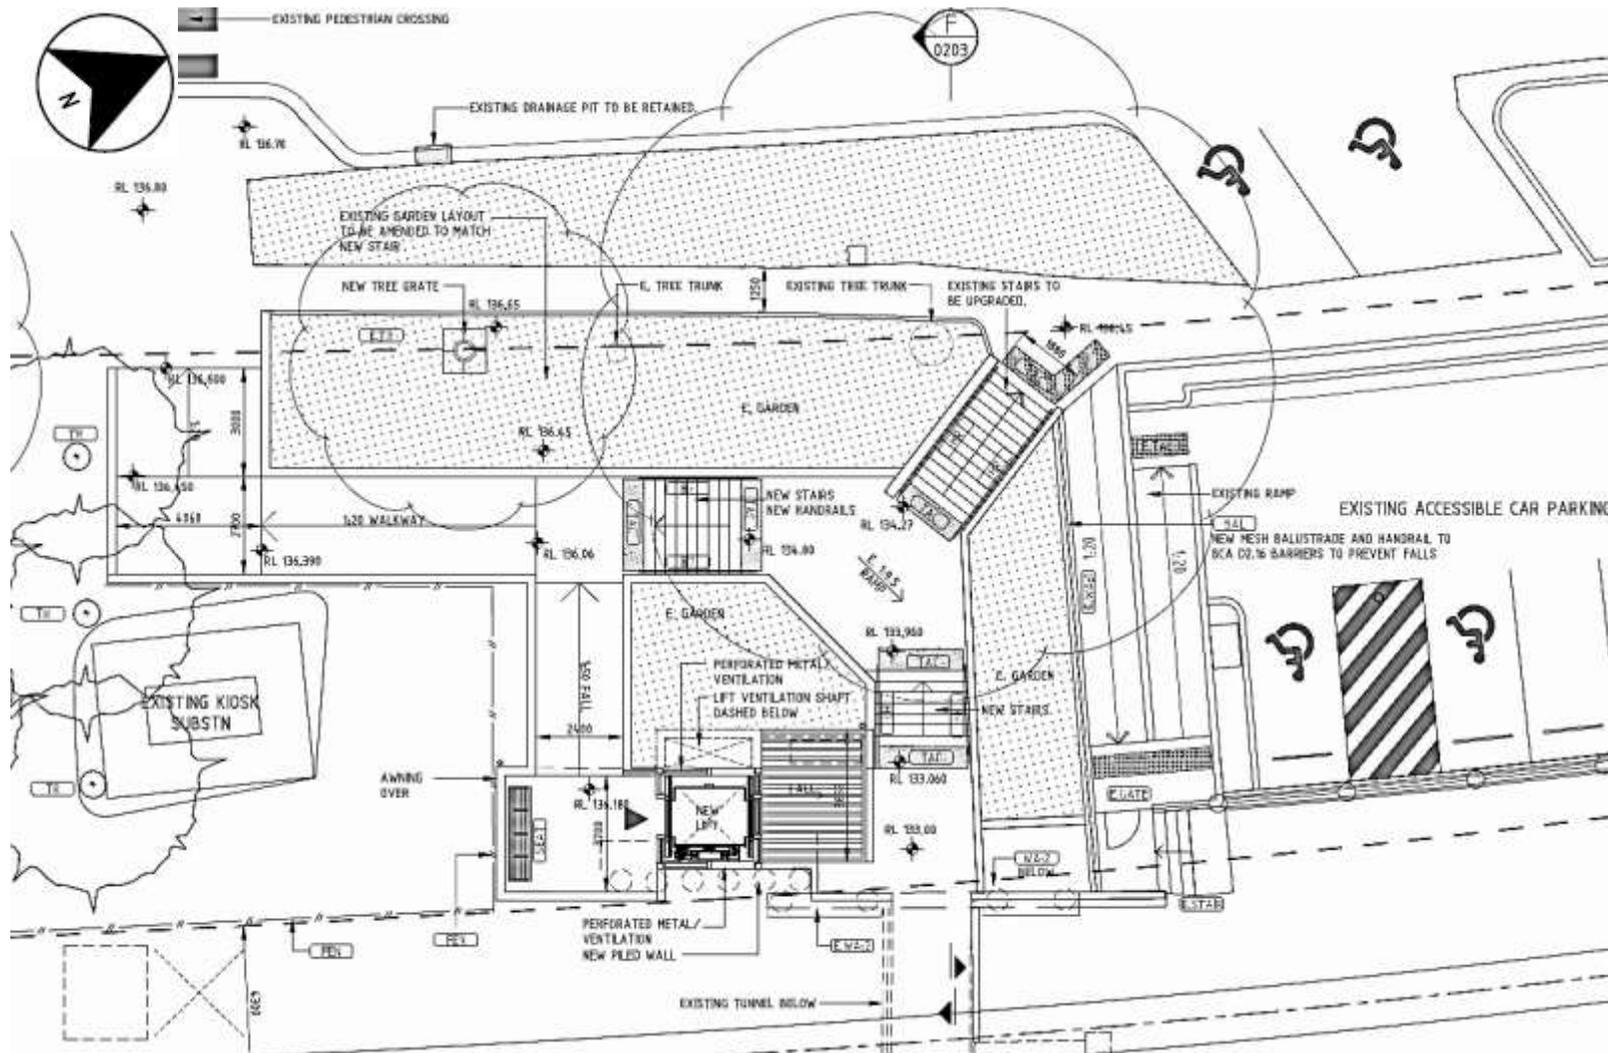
Beecroft Railway Station – Proposed Works – Western Garden, Ramp and Proposed new Lift (Source: CCG Architects)
